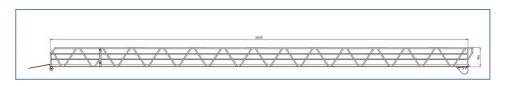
Elevation of Aluminium Gangway Span of 26.0m
